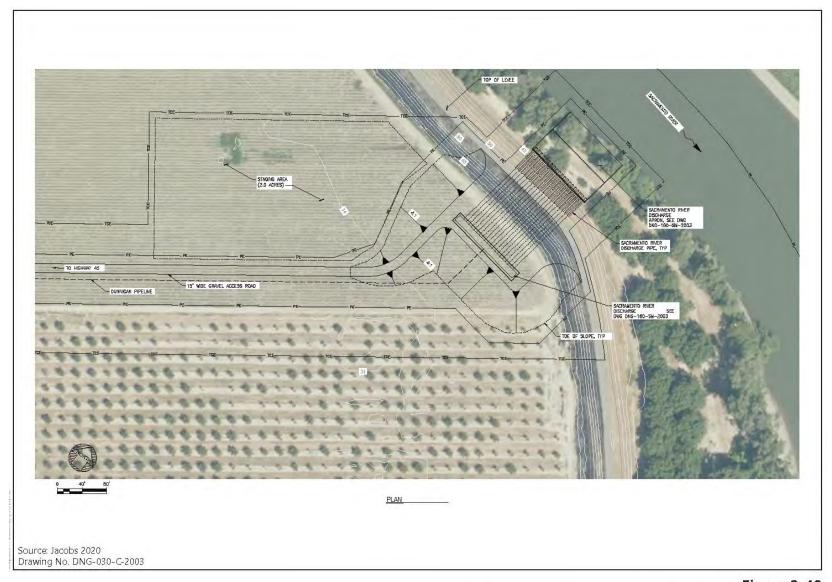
Dunnigan Sacramento River Discharge Site Plan
